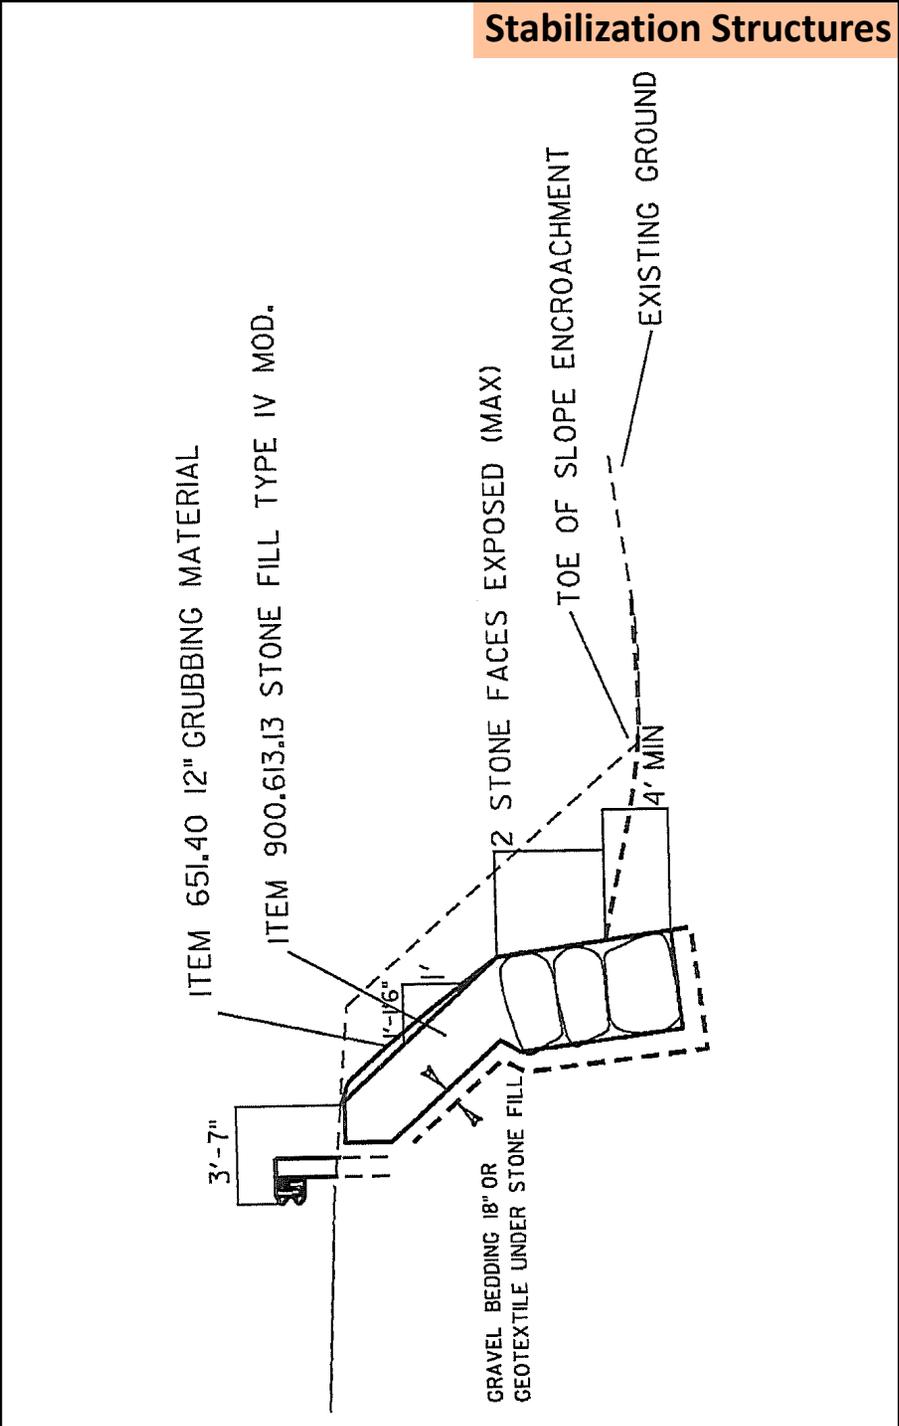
Stacked walls provide an immobile surface to protect the underlying bank but because of their steep slope don't consume as much space between the road shoulder and the river as rip-rap.
